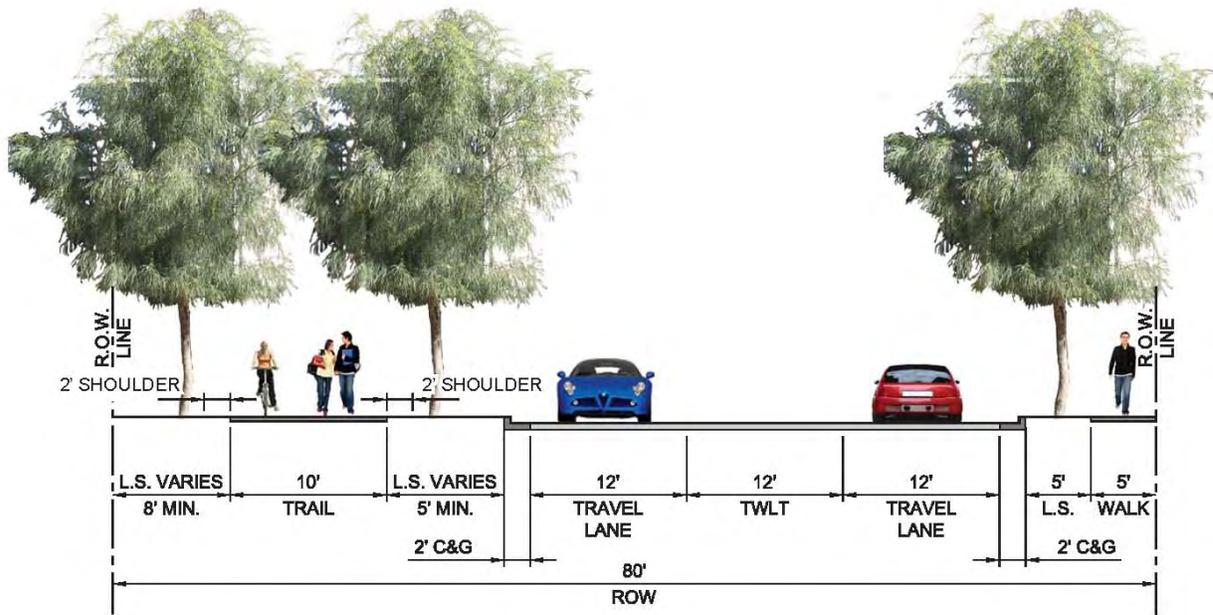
Street-side Multi-use trail Alternative 'A'
